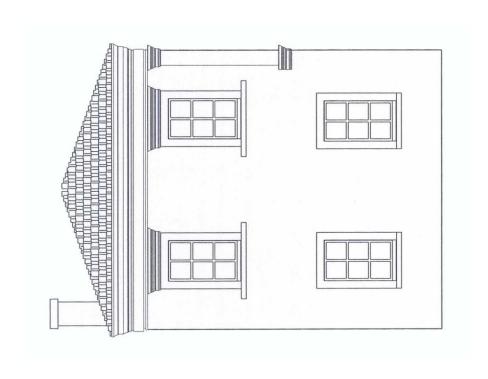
Right Elevation of 39-Türkkuyusu Street Scale: 1/75
